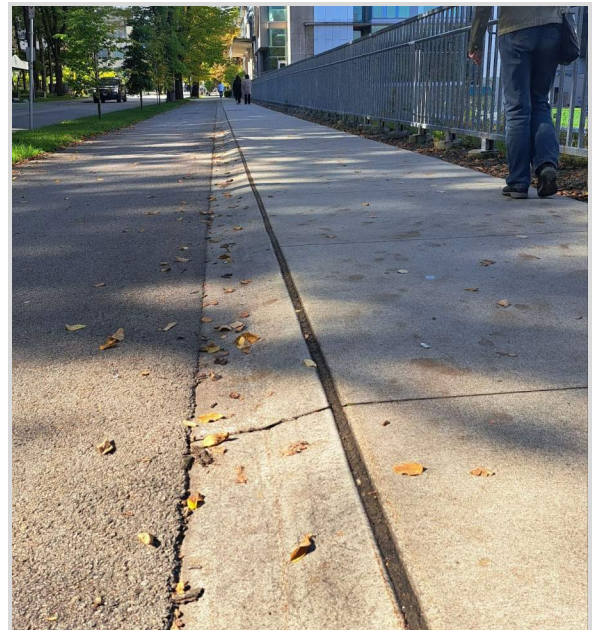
Example Bevelled Curb between raised protected bike lane and sidewalk/boulevard
